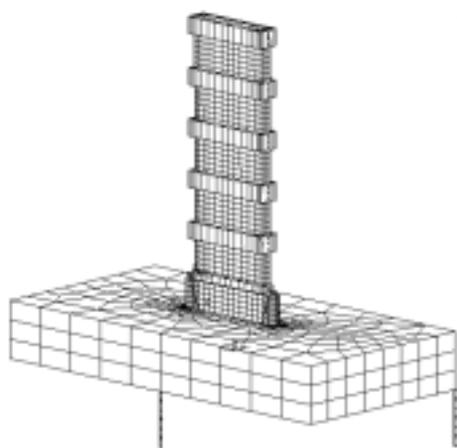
View of the additional masses applied on the wall to account for loads from the floor slab
